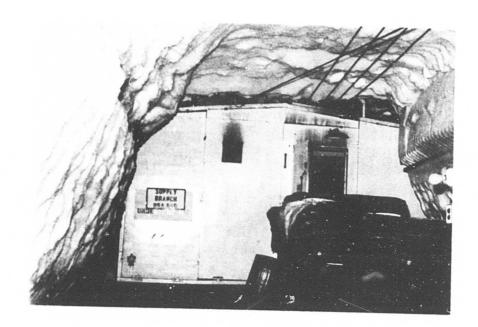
Snow load on roof and walls causes T-5 end wall panels to pull apart.
